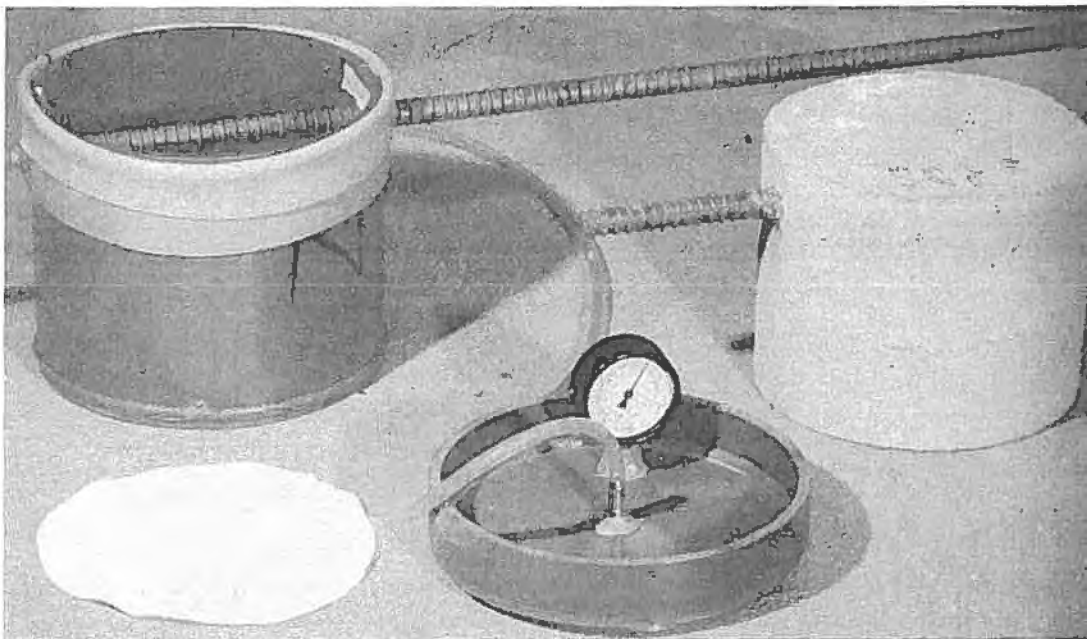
A mould with plastic cover for vacuum suction and a casted pull-out specimen.
